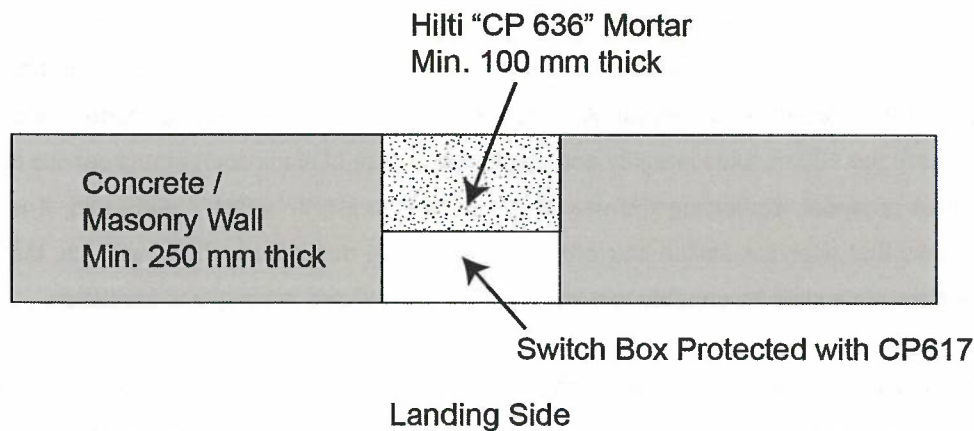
Illustration of the installation details of Hilti "CP636" firestop mortar for installation of switch box
